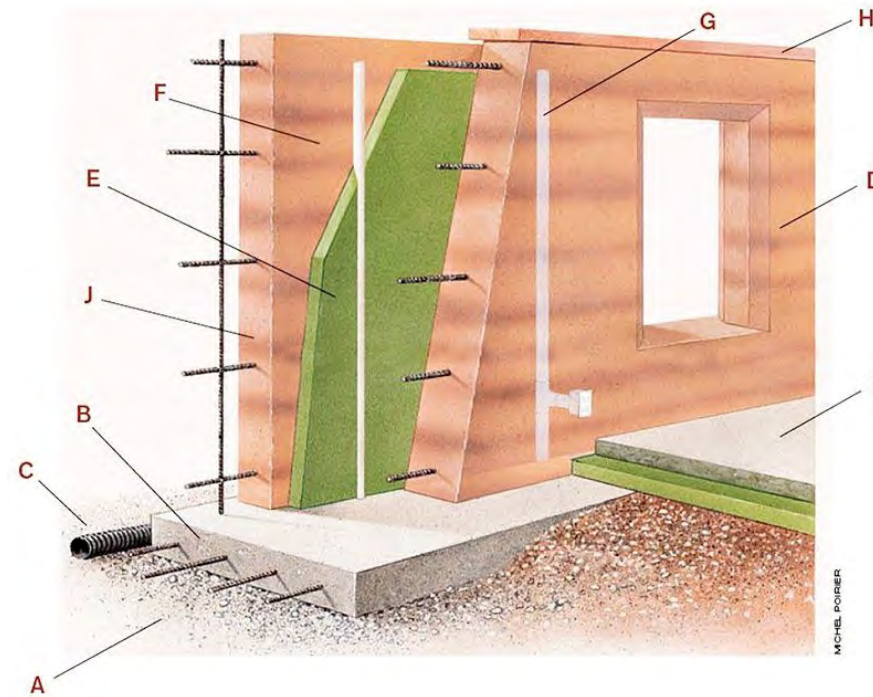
The SIREWALL system: A - Rubble trench – 4 inch bed of drain rock; B - Reinforced concrete footing; C - Drain pipe; D - 12 inch interior rammed earth wall, reinforced with steel rebar; E - 4 inch foam insulation; F - 8 inch Exterior rammed earth wall, reinforced with steel rebar; G - EMT pipe to function as electrical conduit; H - Wooden top plate, anchored to wall, ready for roof truss; I - Interior floor; J - Optional anti-graffiti coating. Image and information: SIREWALL.com, 20.
